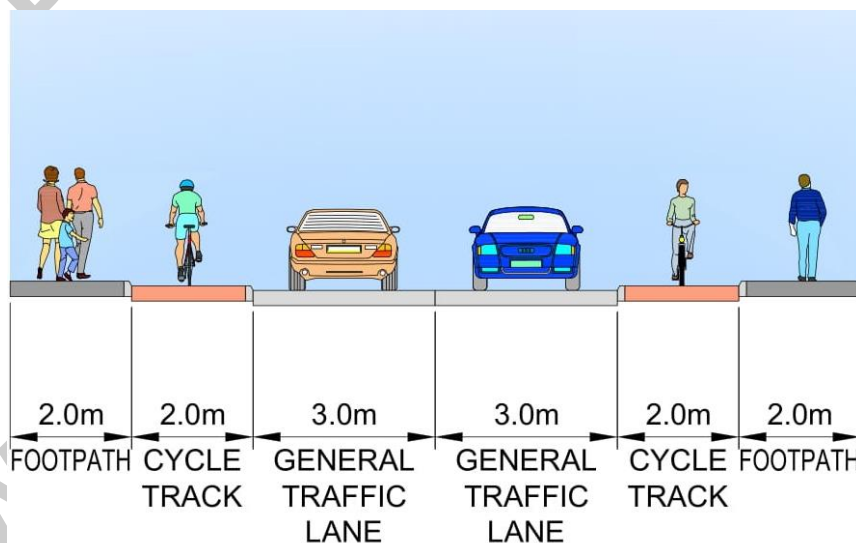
Section 2, Proposed Option 4b – Cross Section B-B
